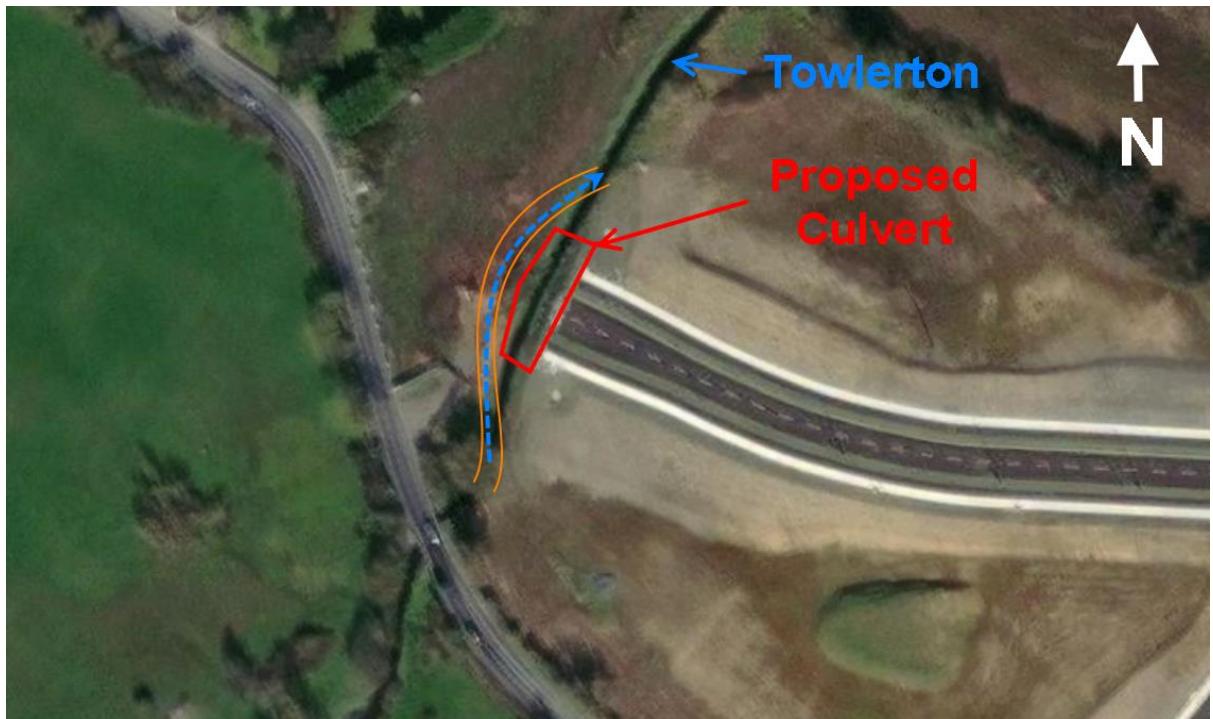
Proposed Temporary Stream Diversion for Culvert Construction
